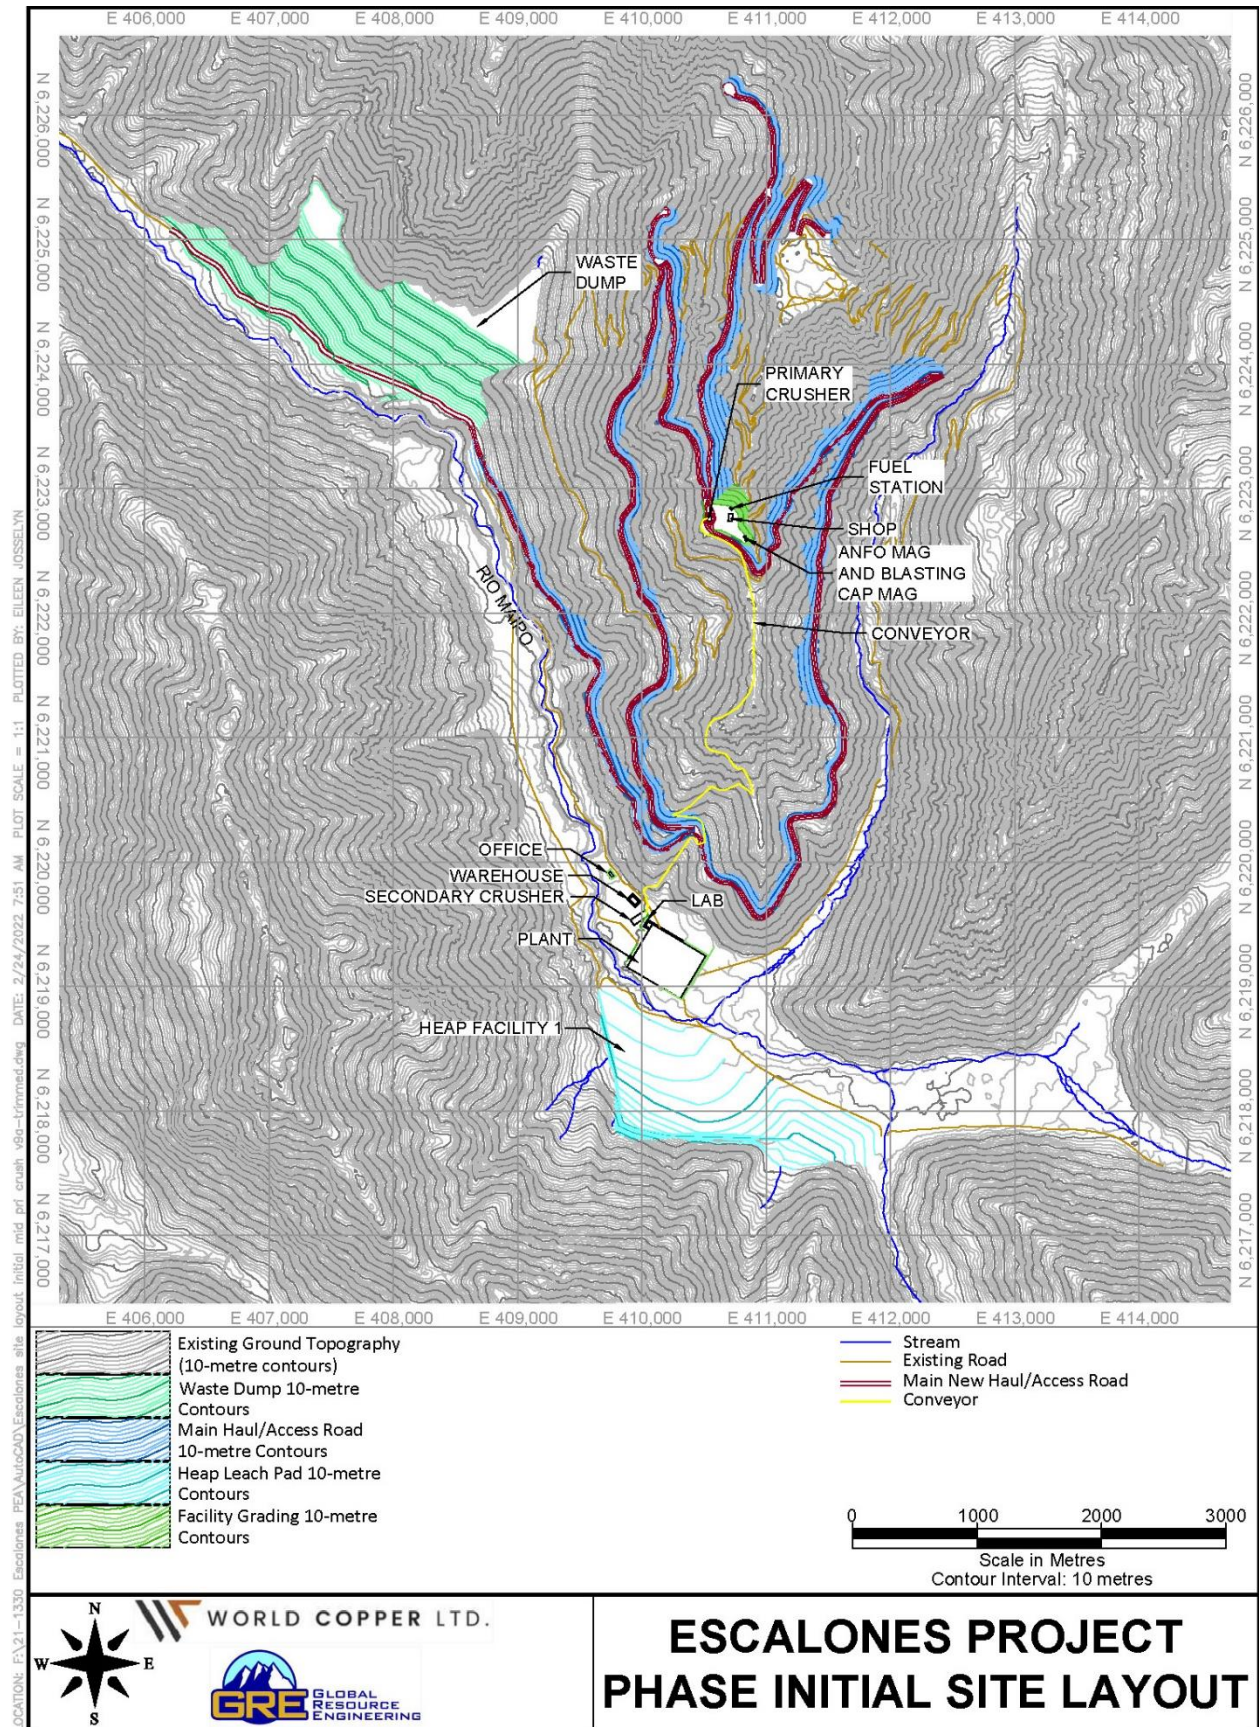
Escalones Copper Project Phase 1-1 Site Layout
